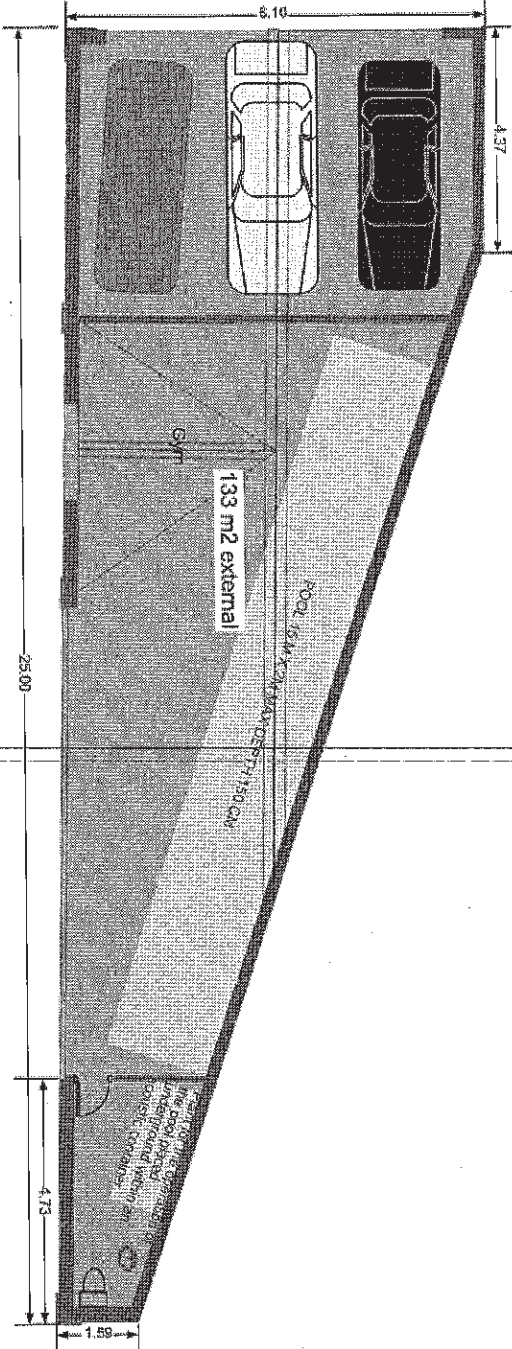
/B: Block Plan Scale 1/200 at A3.
